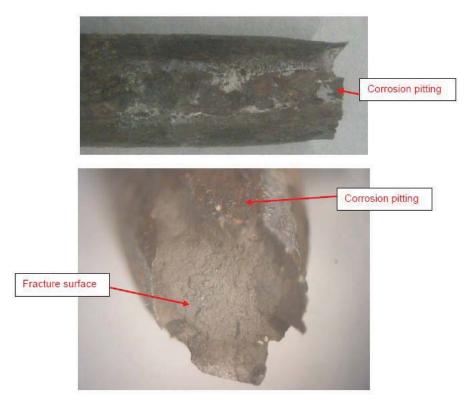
Surface (top) and fracture surface (bottom) of wire W71
